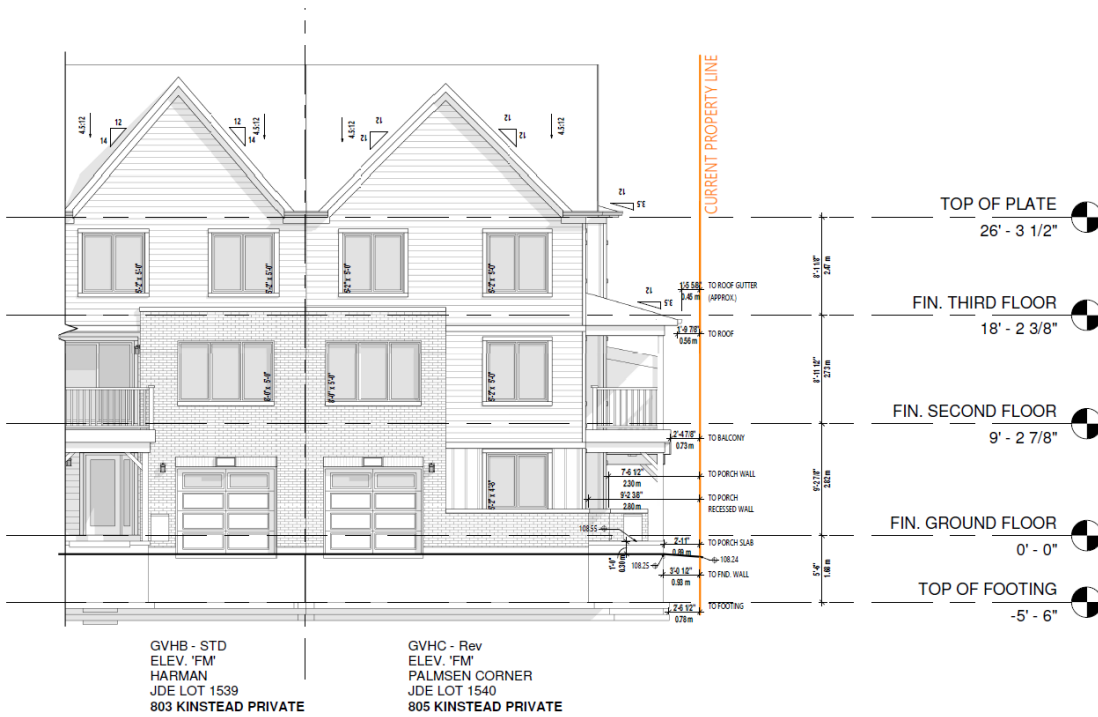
805 Kinstead Private Front Elevation (looking east)
